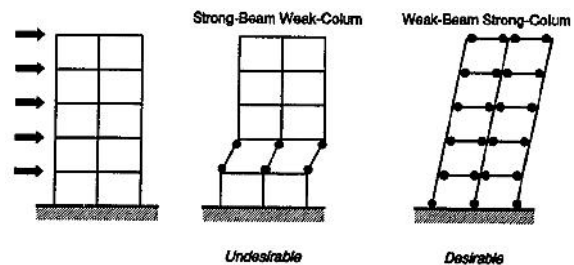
possible failure mechanisms for frame structures under lateral loads [11]
